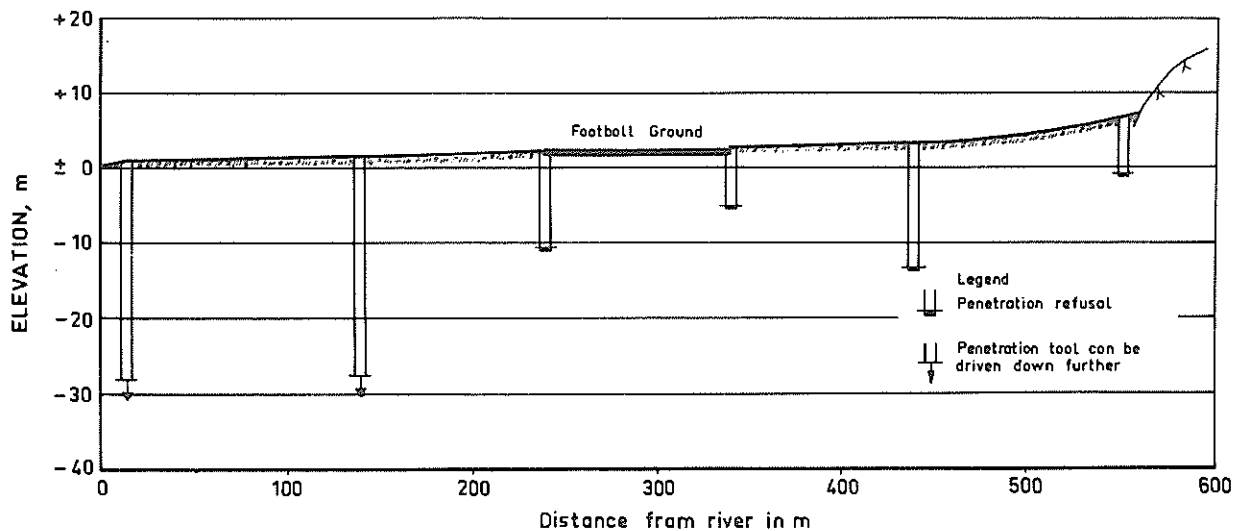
Section at Lödöse football ground showing depth and slope conditions (after Tullström, 1961)
